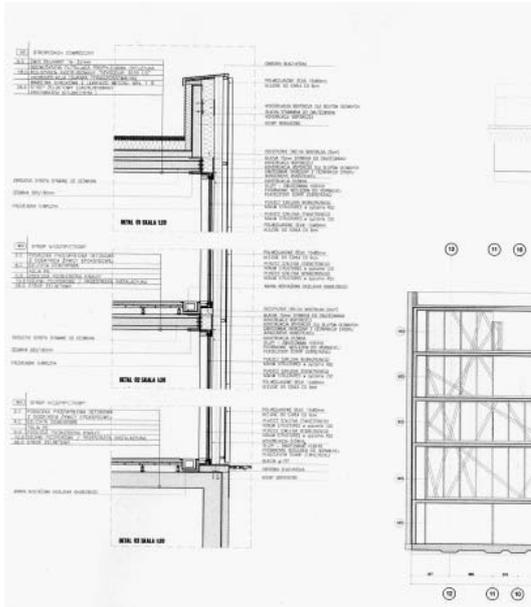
Diploma design 3 – Modern Media Centre – cross section and details of external wall.
